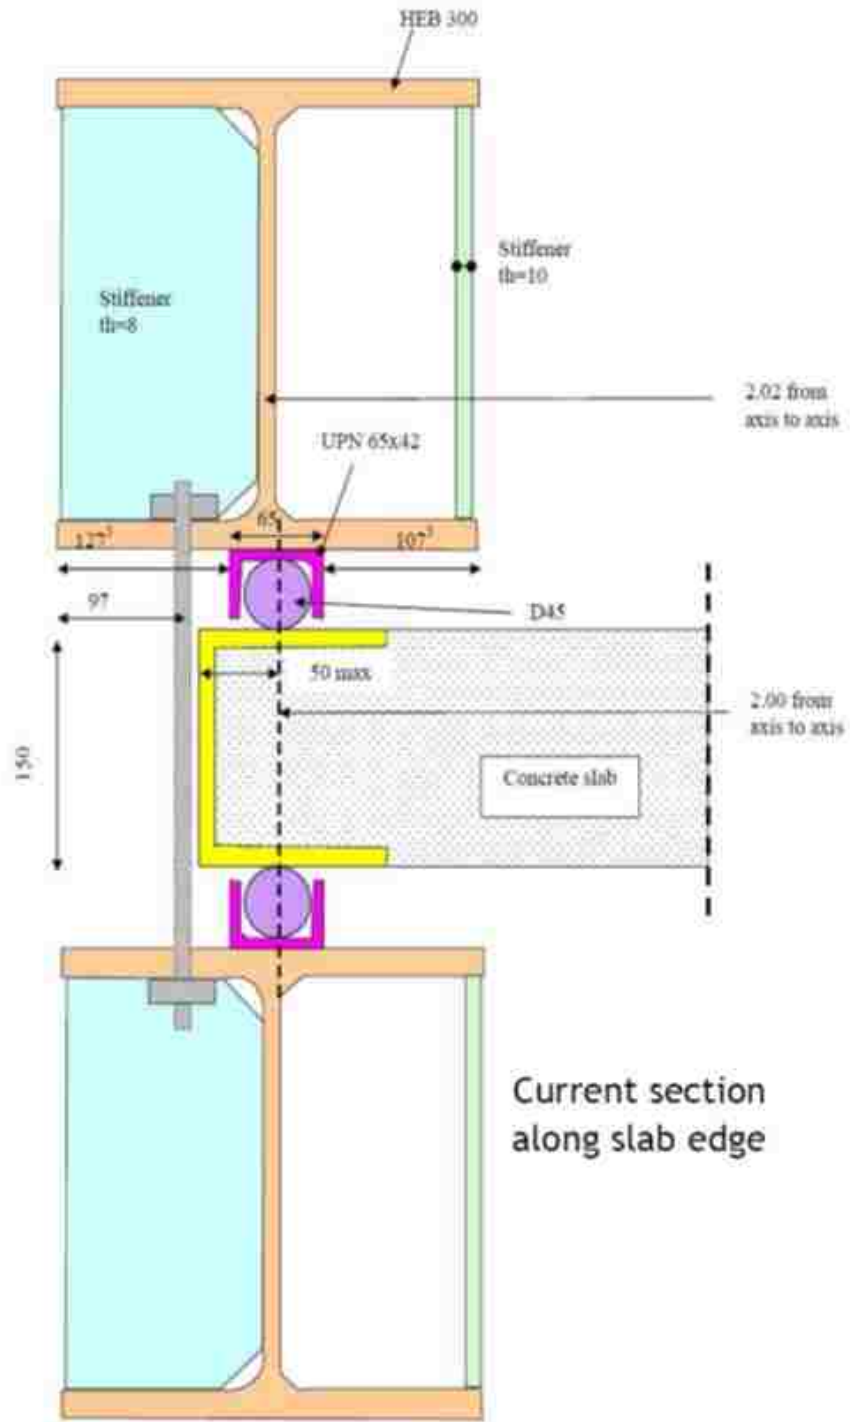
IRSN VTT Flexural mounting fixture schematic
